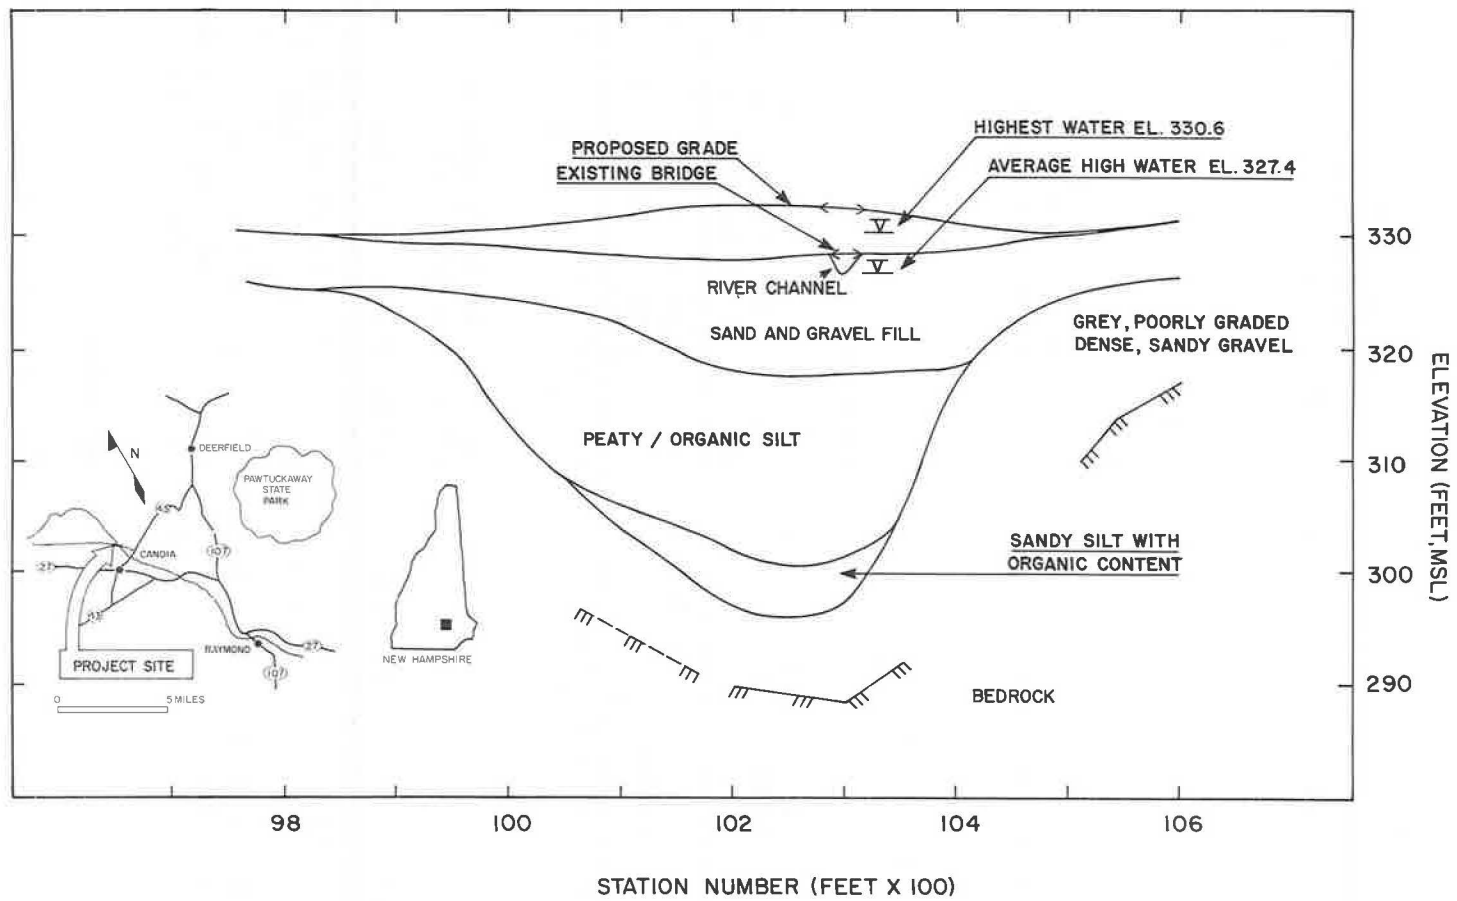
Site location and profile of the New Boston Road embankment before 1985 construction.
